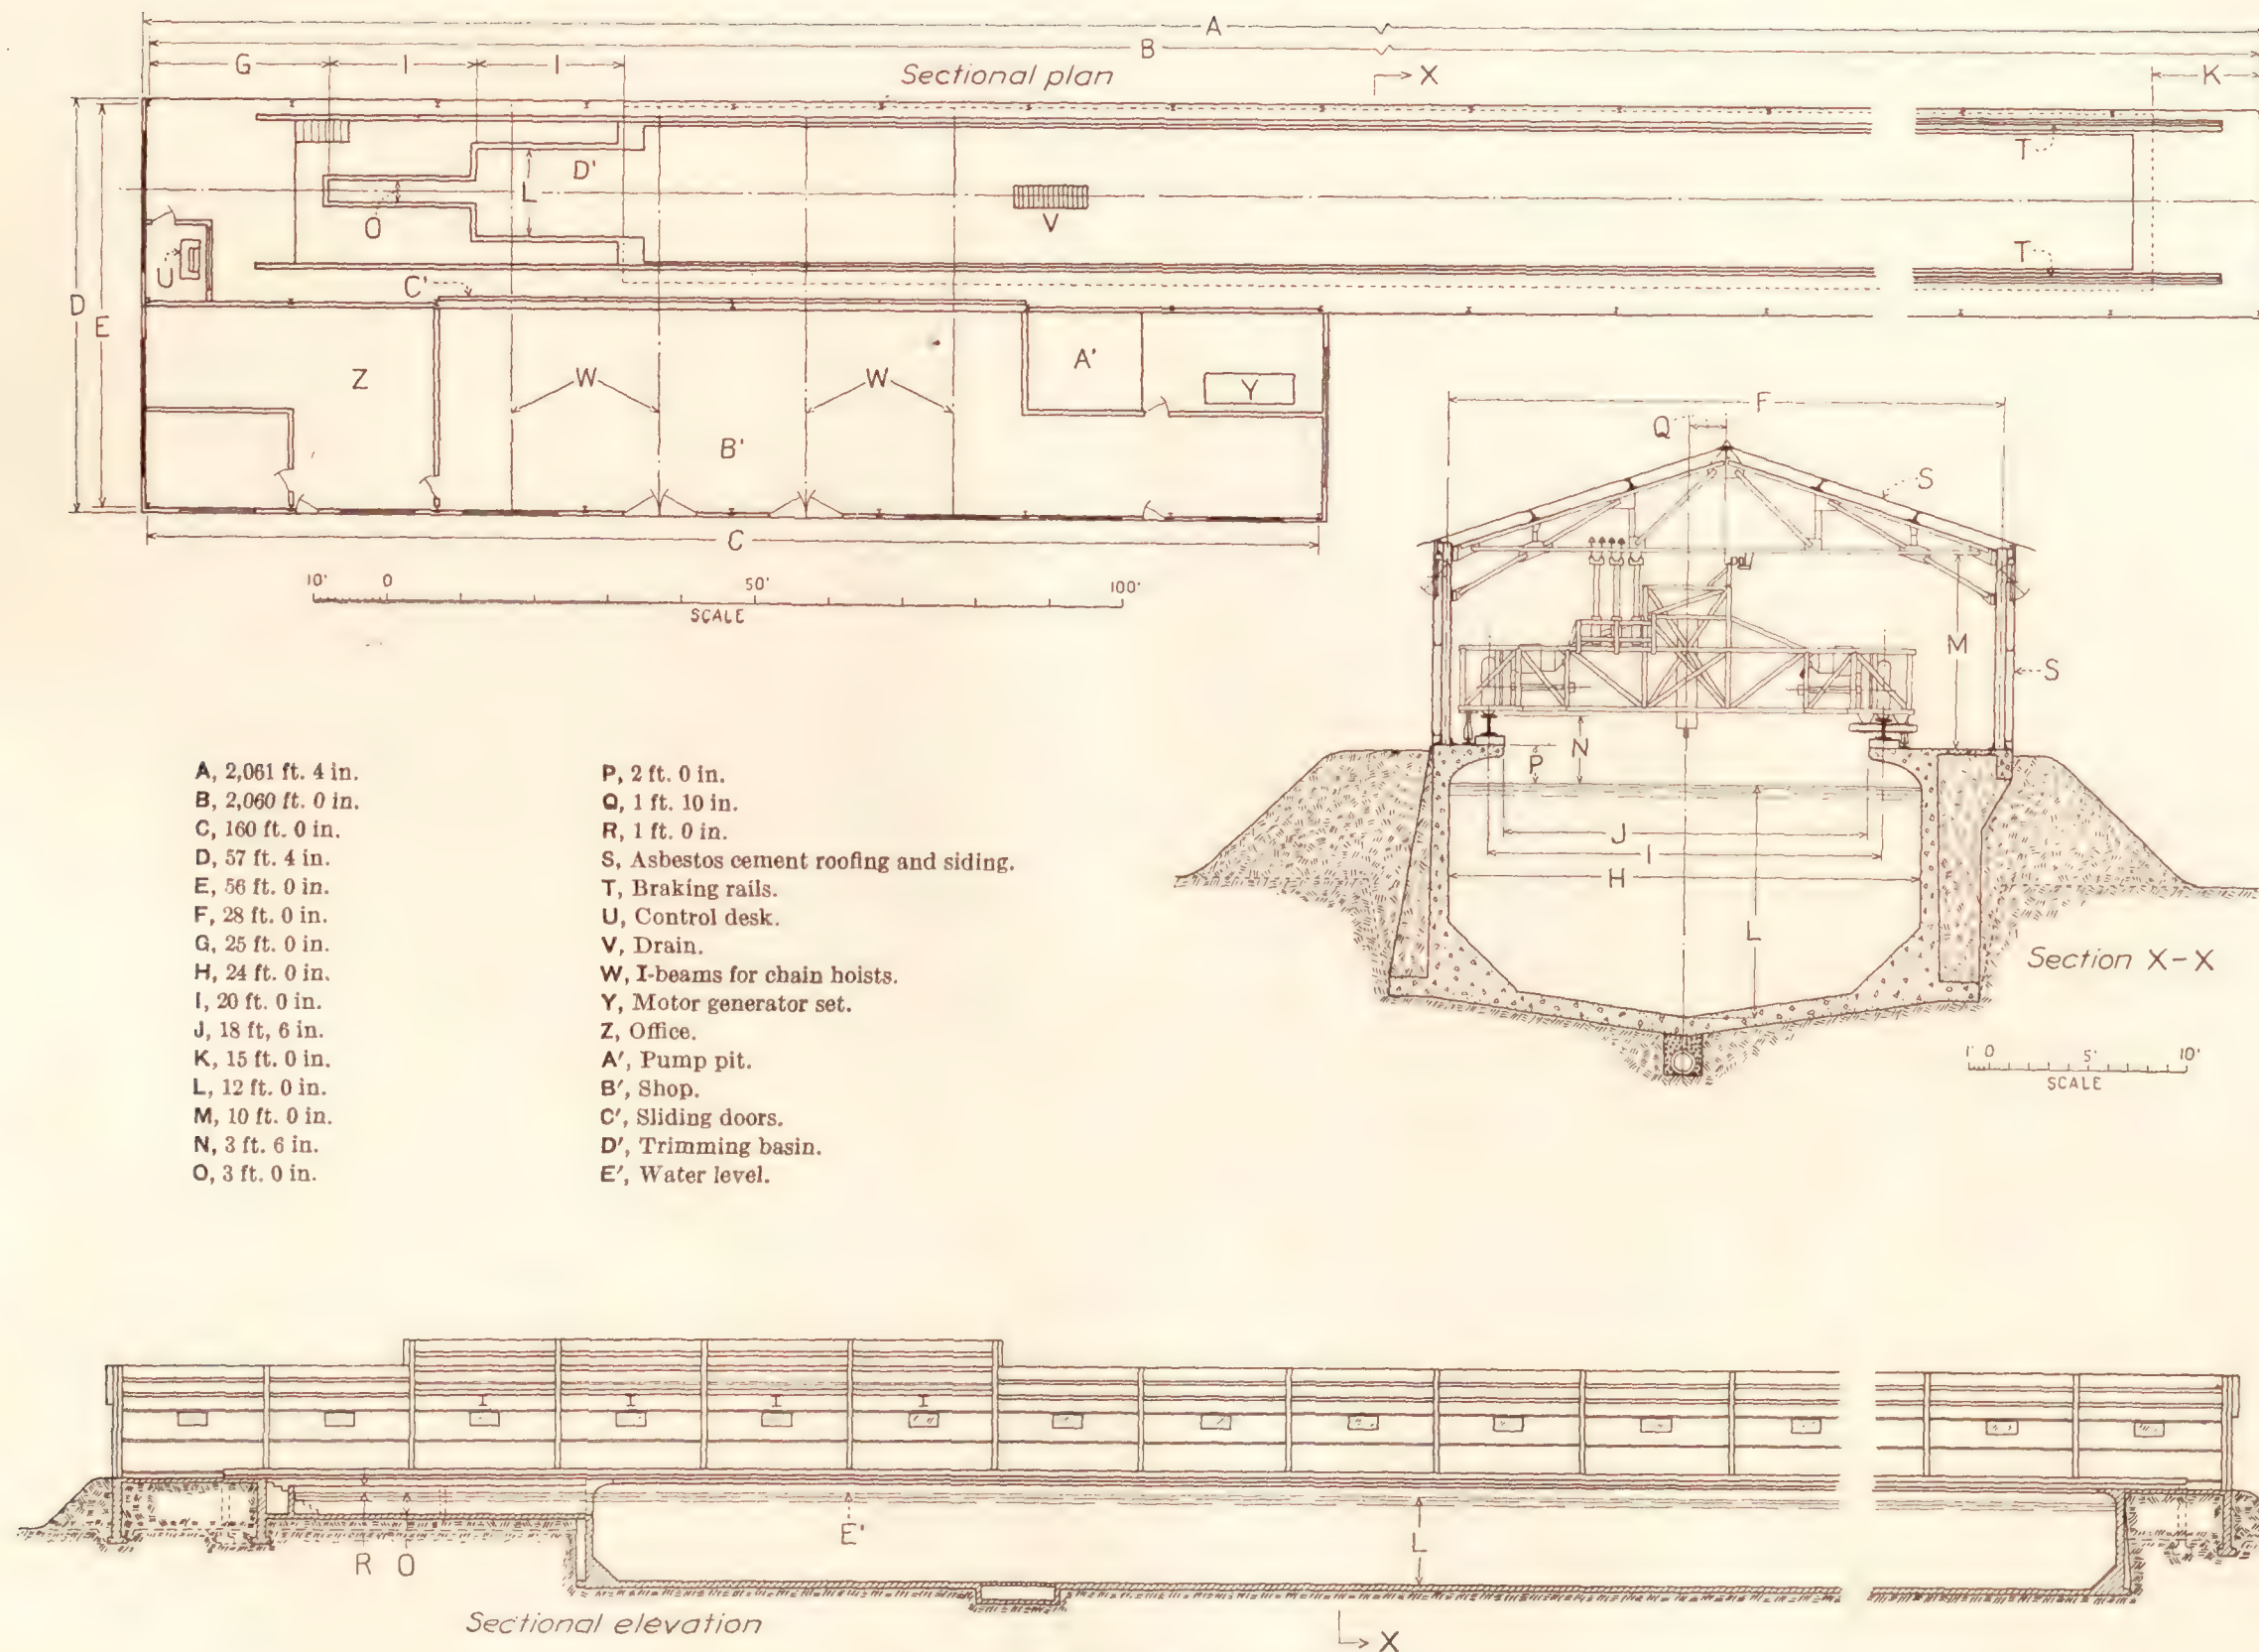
Plan and section of the N.A.C.A. tank.
